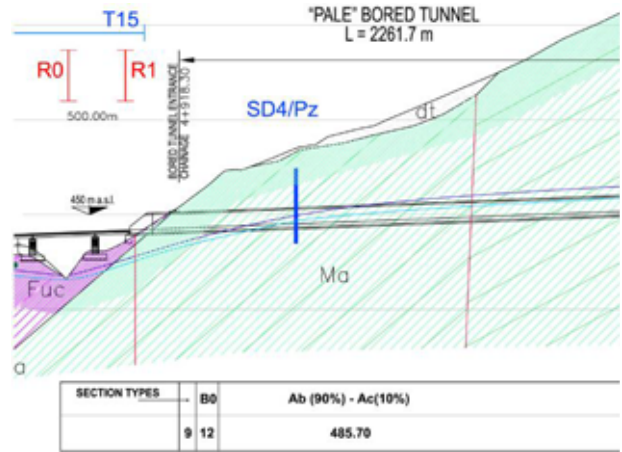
Geology and section types according to Detailed Design (North tunnel tube)
